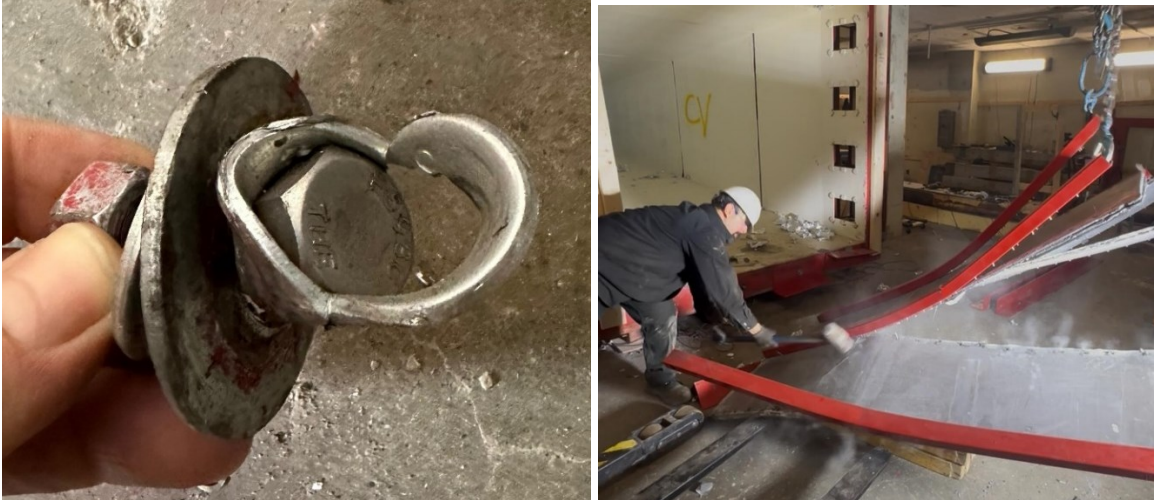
Set 1 specimens after failure, failed bolt (left), demolition (right)
